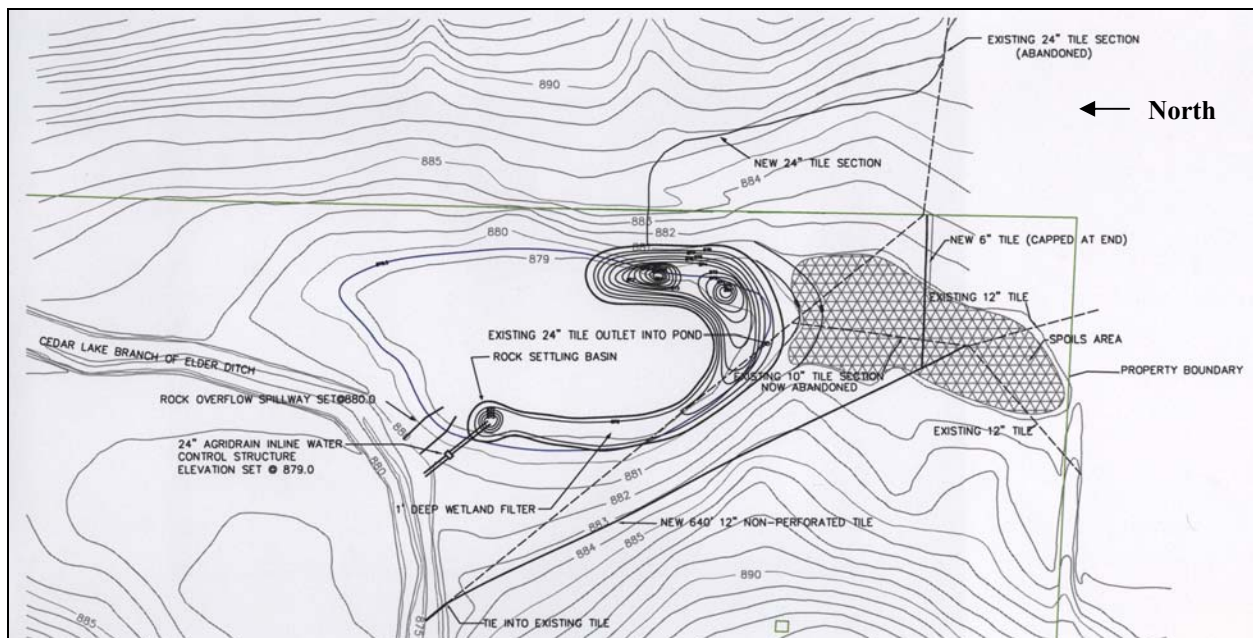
Palmer sediment trap site plan. Note: Figure not to scale.
